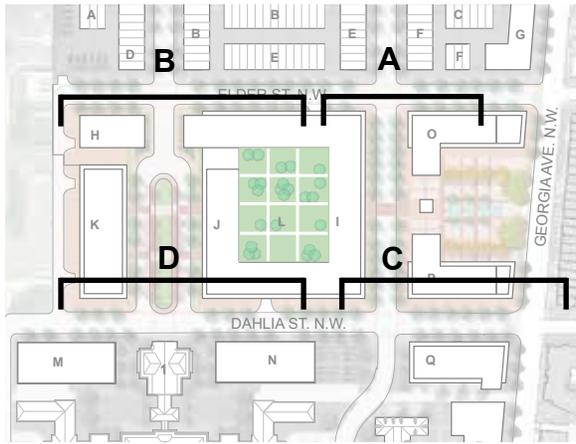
Site Sections Key Plan - Town Center. Source: Perkins+Will
